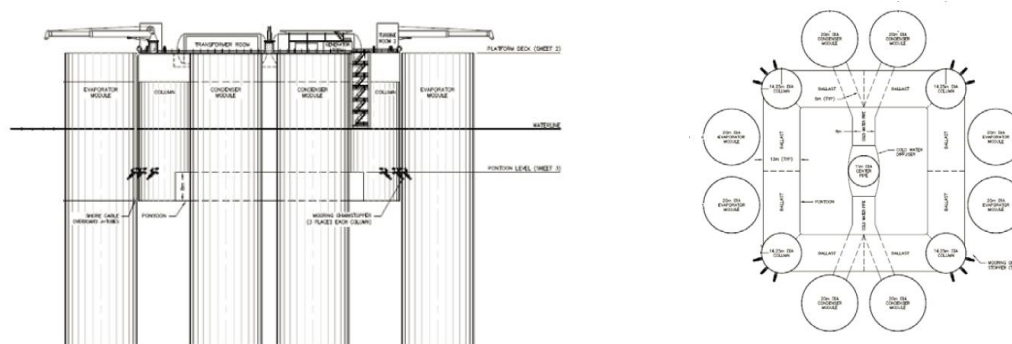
100 MW OTEC platform elevation view (L) and plan view (R)
